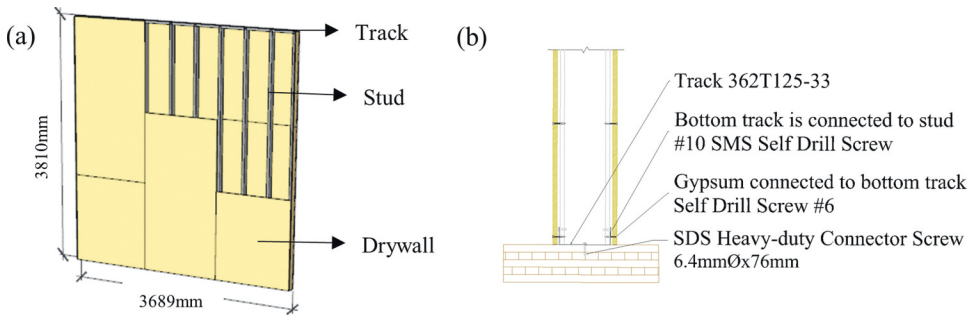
(a) Partition walls components – 3D view, (b) detail of connection of walls to the bottom diaphragm.
